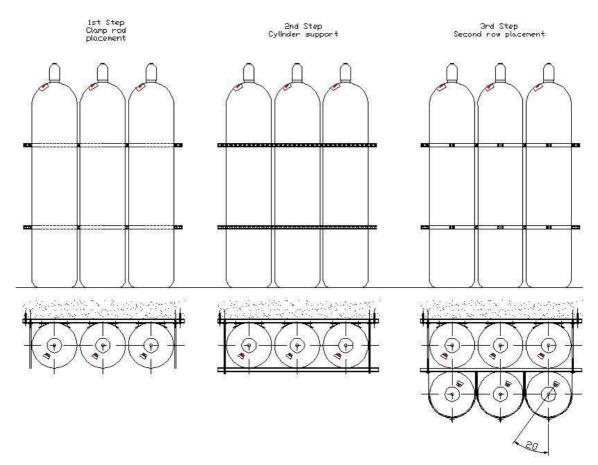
Cylinder fixing – Double-row multi-cylinder system
